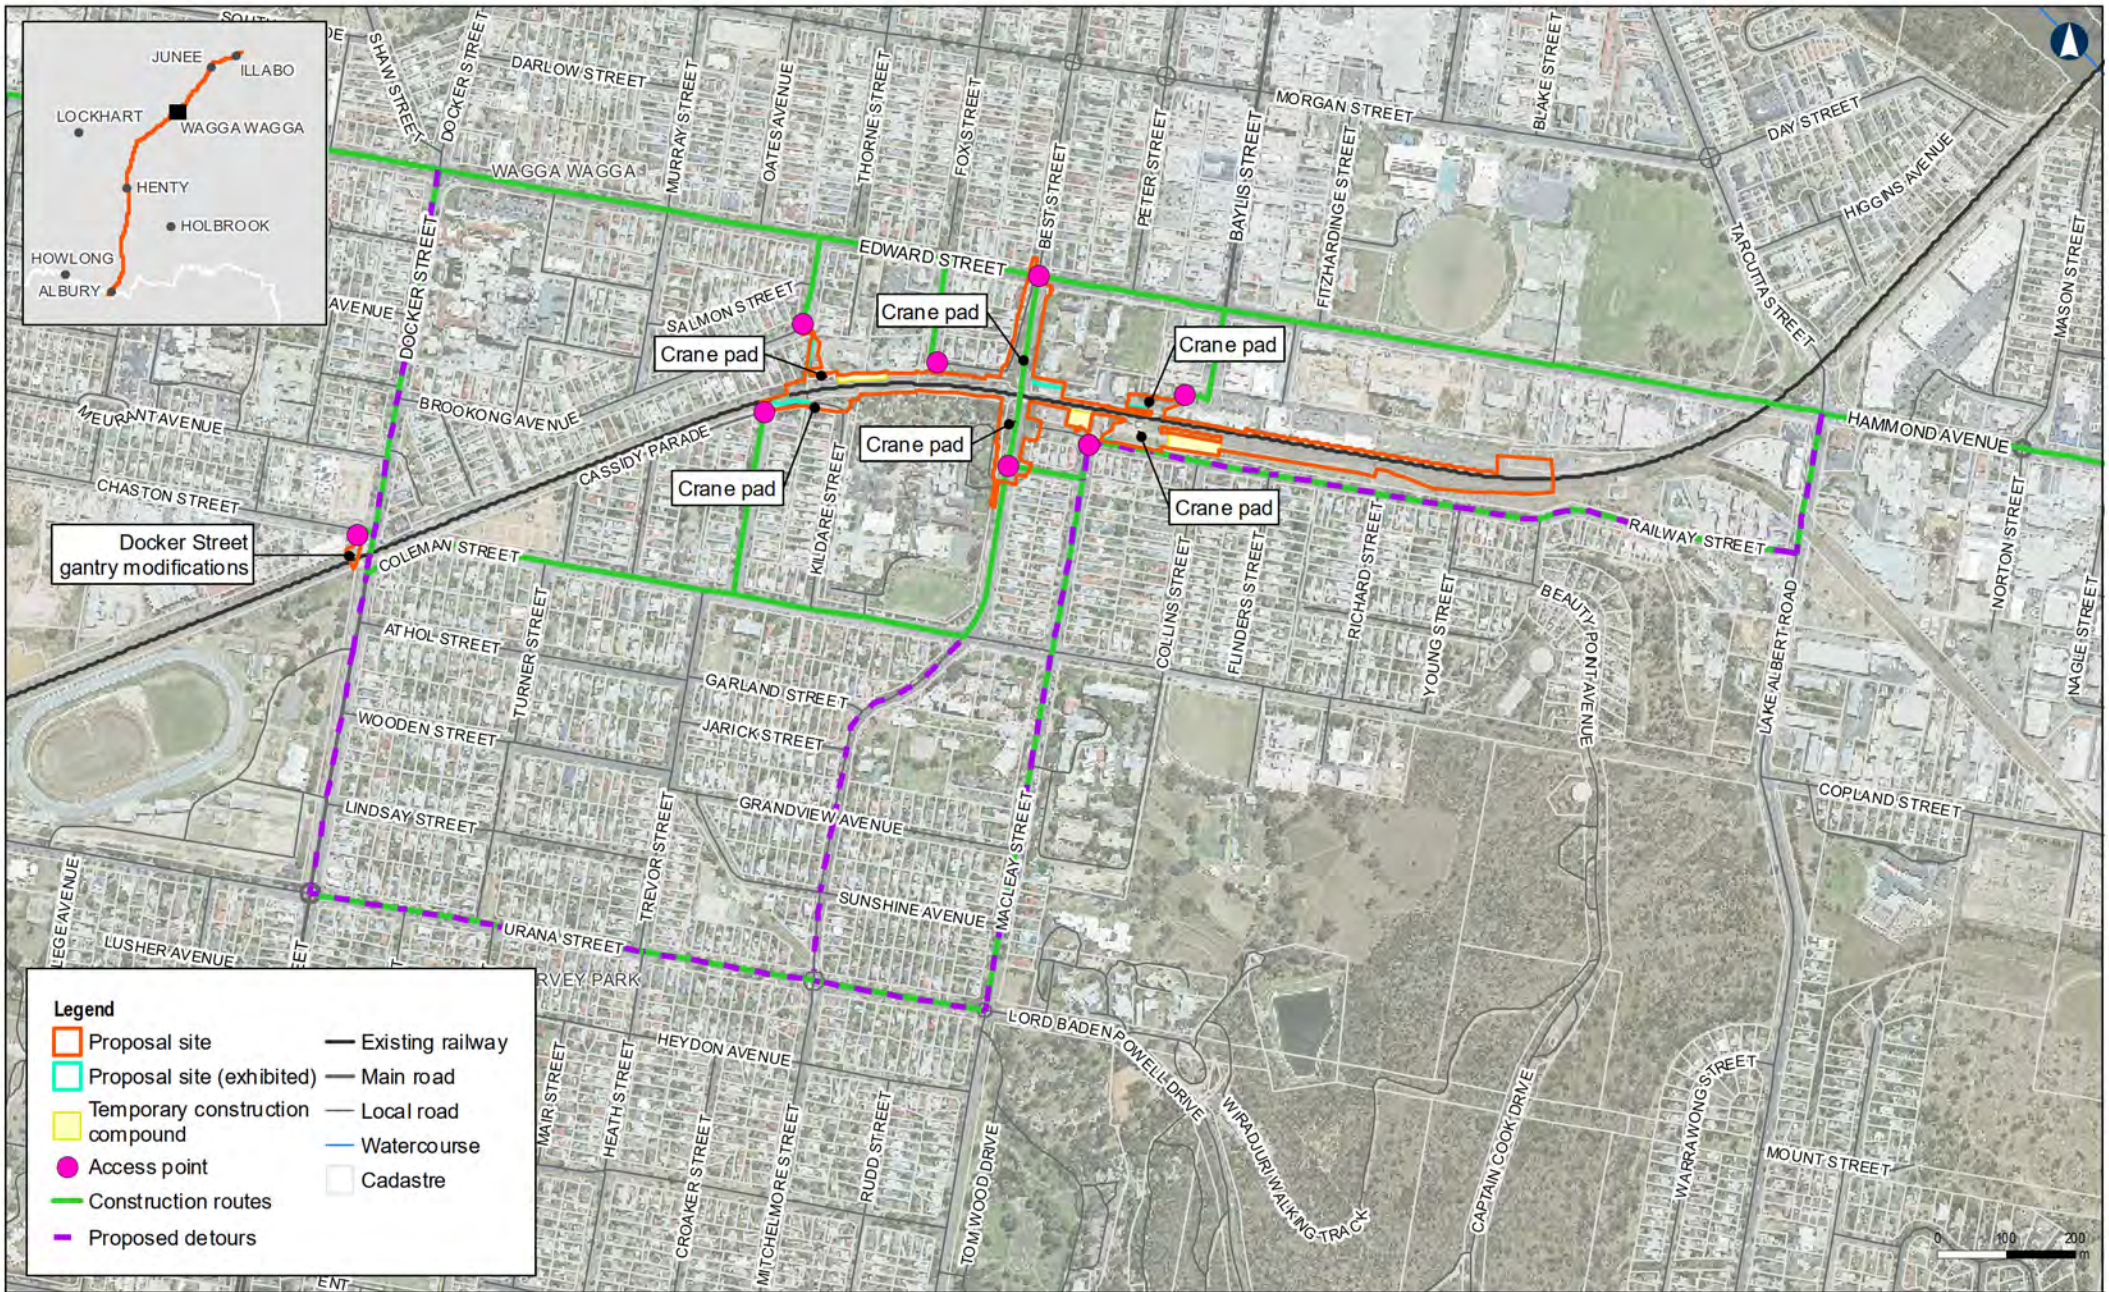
Revised Construction layout of Wagga Wagga Station and surrounds
